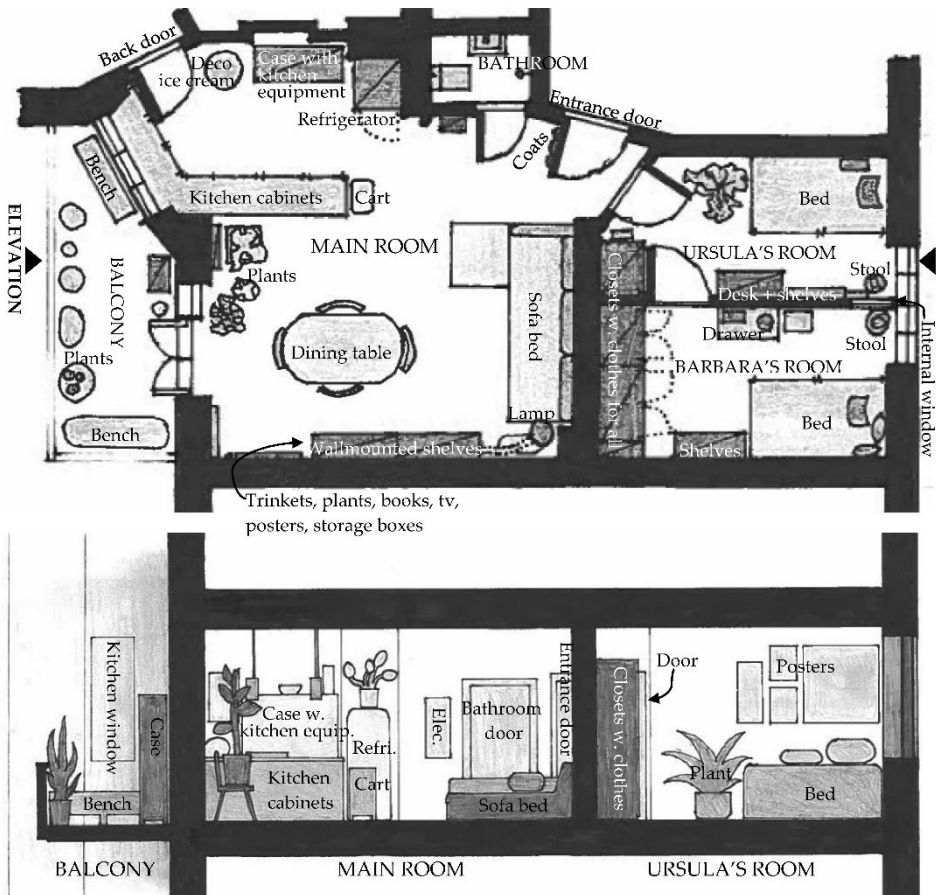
Plan and cross-section of dwelling in Case #3. Illustration by author.
